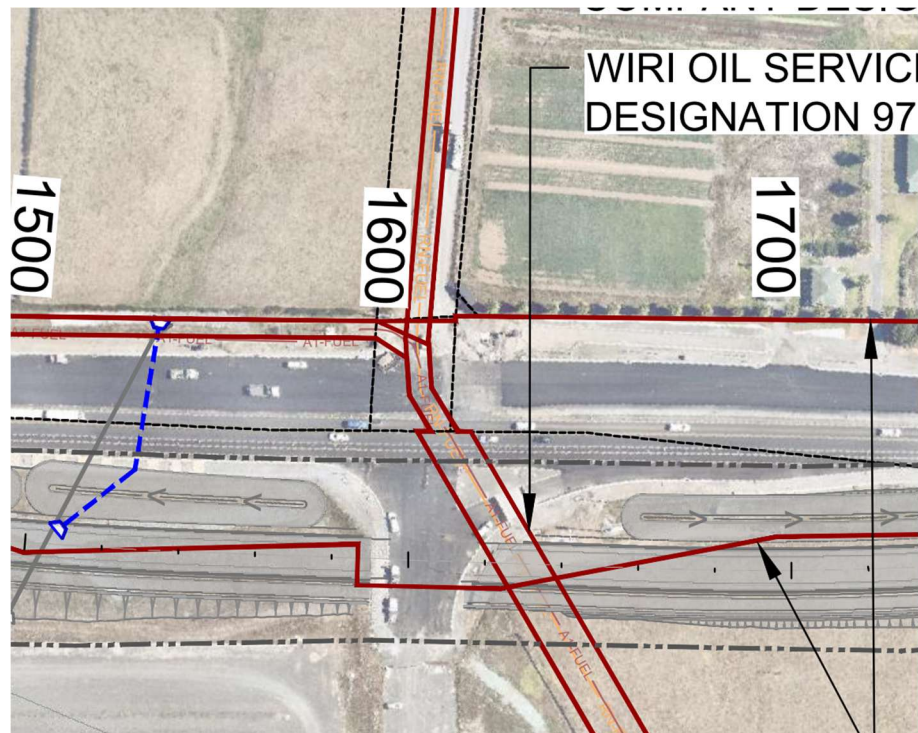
General Arrangements Plan – NOR 4B Airport to Botany
